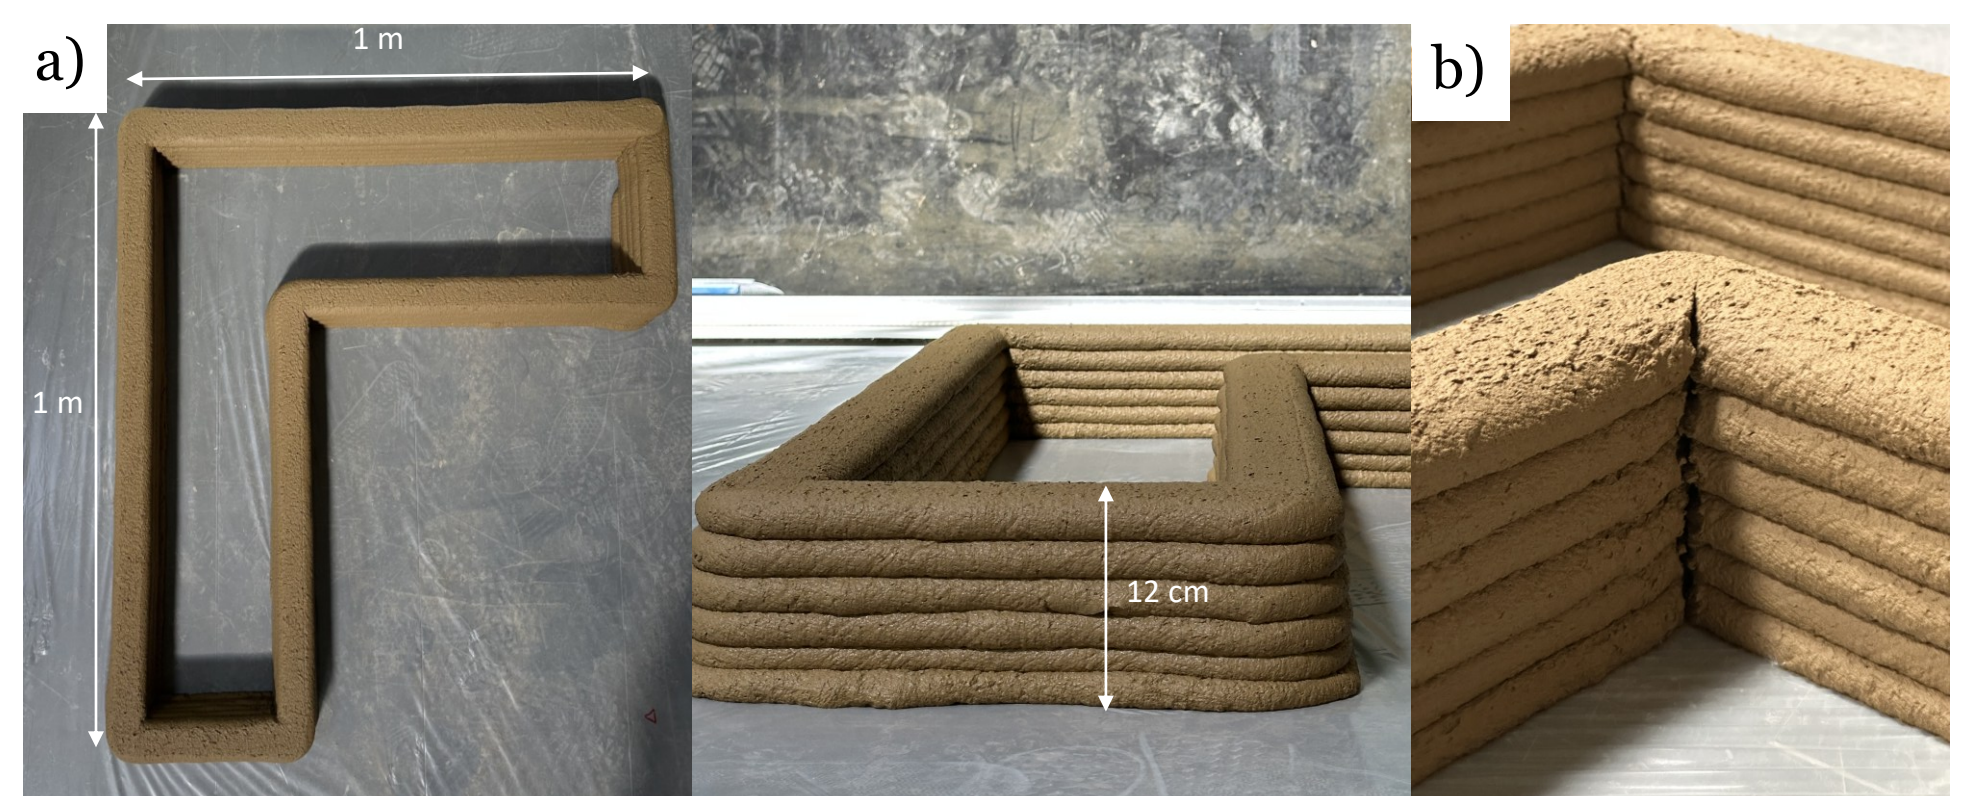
a) Top and side view of printed element, b) Cracking failure
